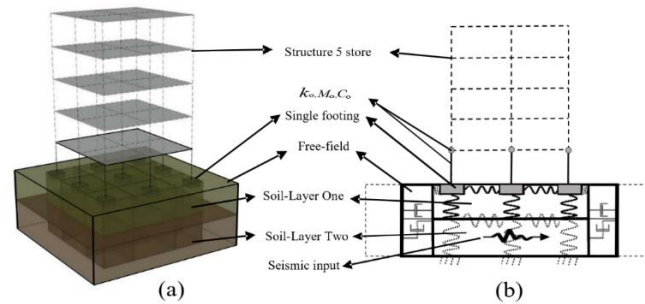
Supported by foundations considering dynamic soil-foundation-structure interaction with building in seismic motion (a) 3D model clarifies (b) Model 2D supported by foundations considering dynamic soil-foundation-structure interaction with building.
